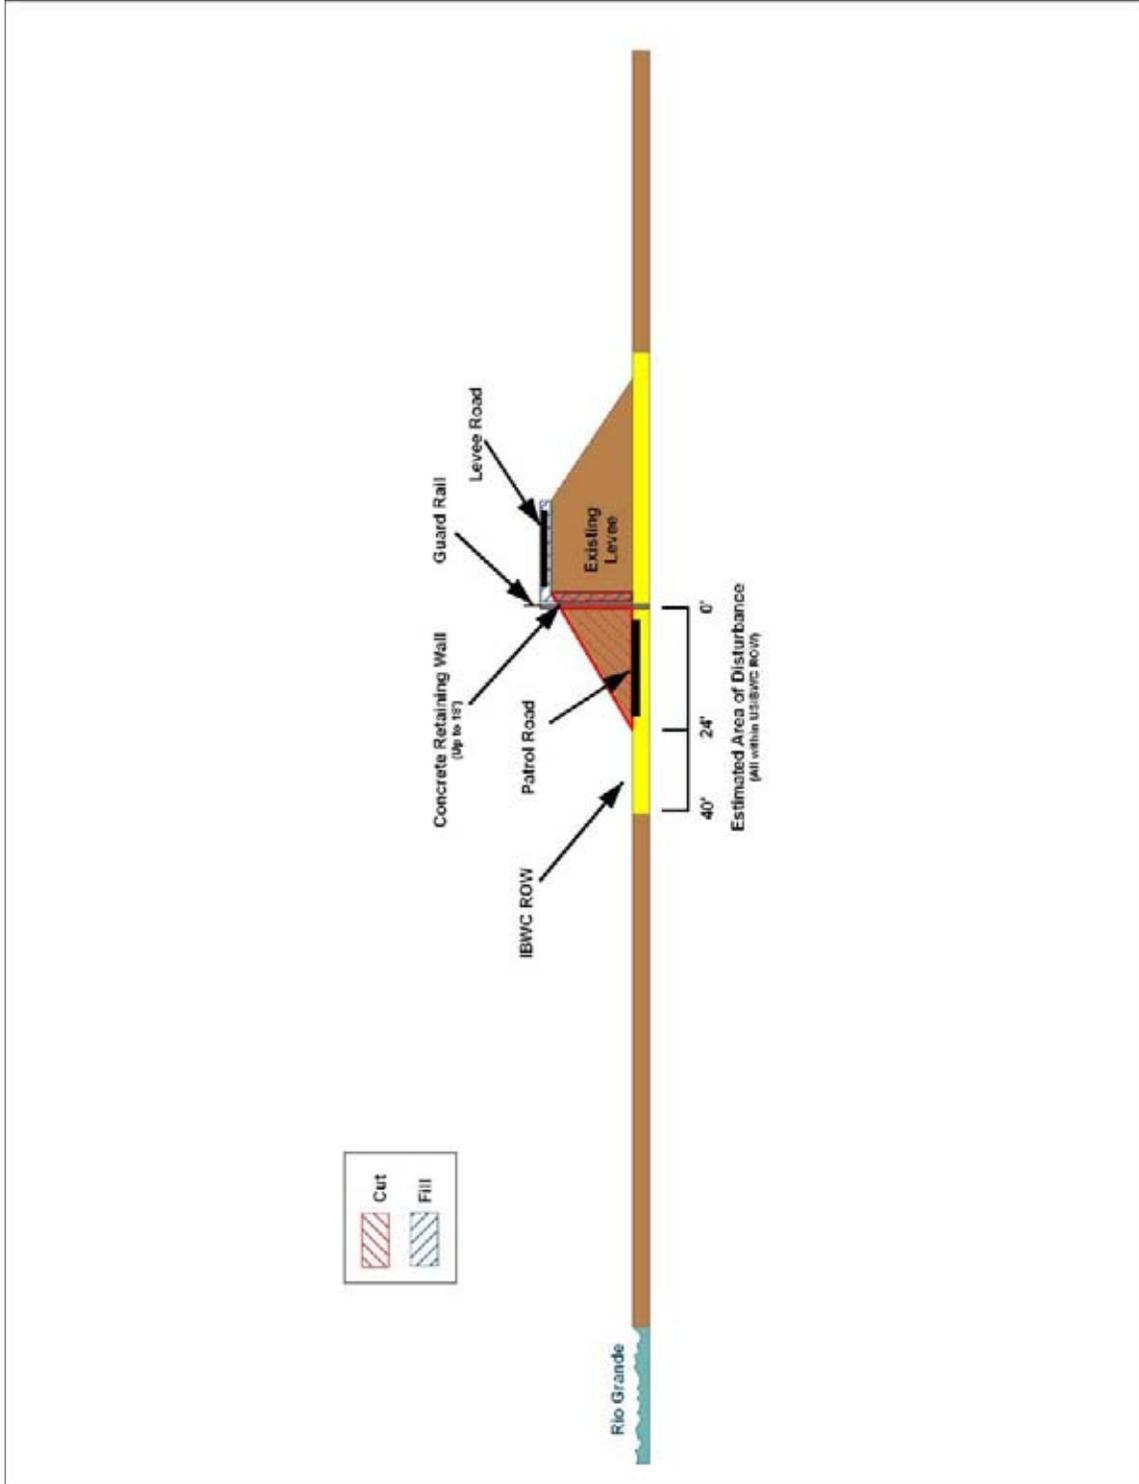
Illustration of Typical Flood Protection Structure/Concrete Fence
